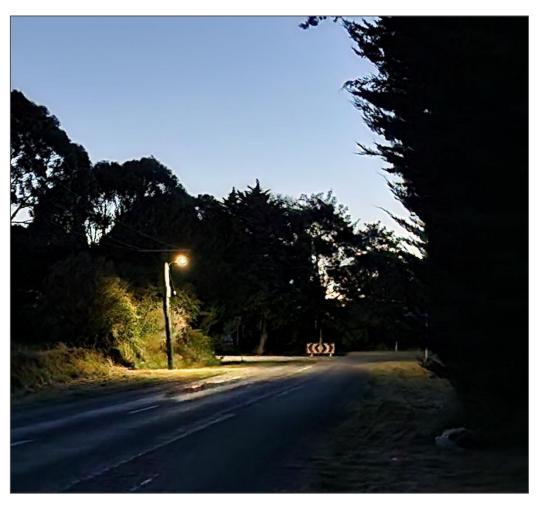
Ryans Road/Grays Road Intersection Lighting
